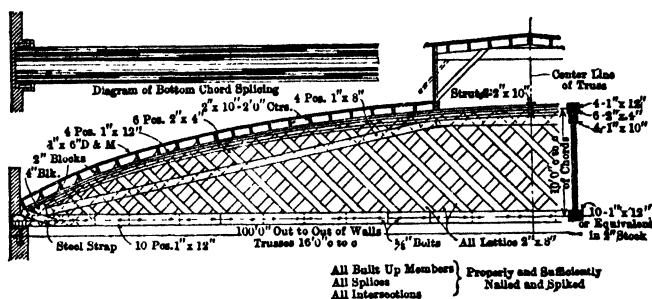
Wooden Lattice Truss with Curved Chord. Double Strength Truss Co., Chicago
